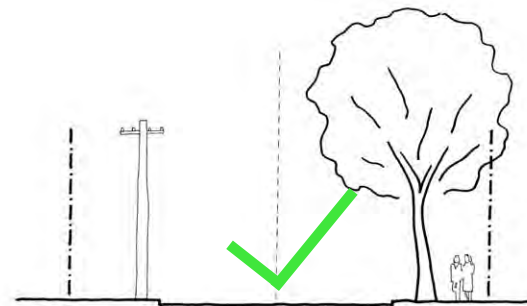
Typical street section with no street tree under powerlines and medium size trees on opposite verge. Allows larger tree on opposite verge to contribute to streetscape while removing the conflict between trees and existing services.
